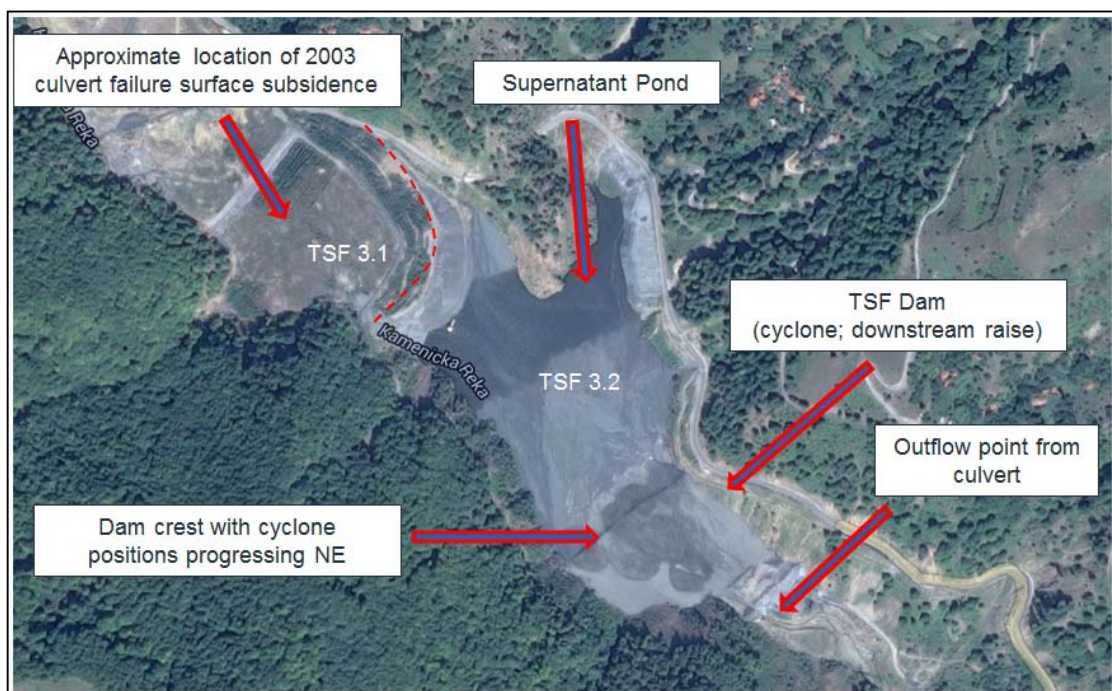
TSF 3.2 Annotated Layout in Plan View (Image from Google Earth)
